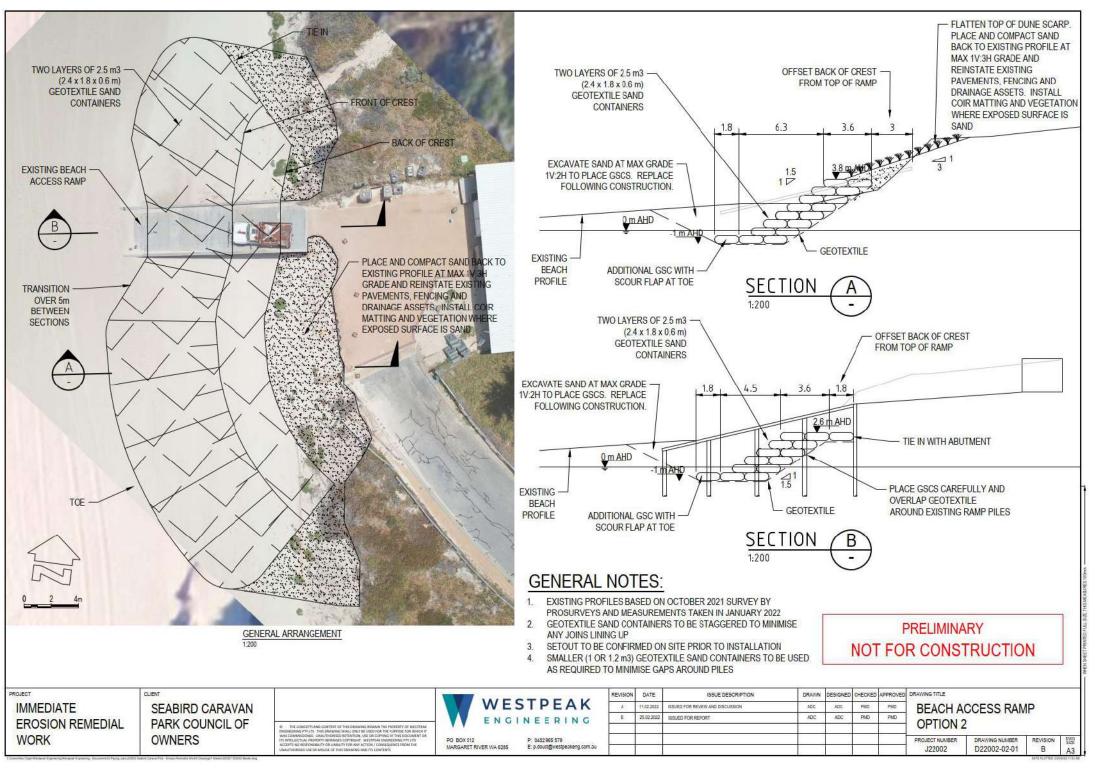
Beach Access Ramp Option 2 – Geotextile Sand Containers & Sand Fill
